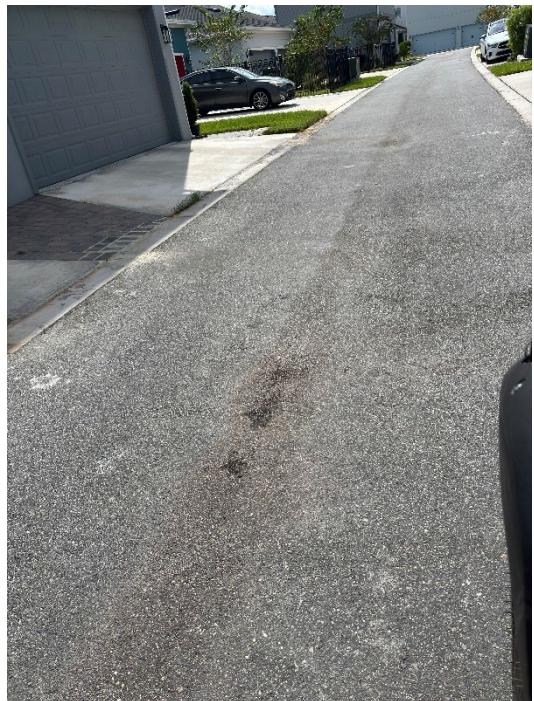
Laggett Alley–Asphalt Damage
